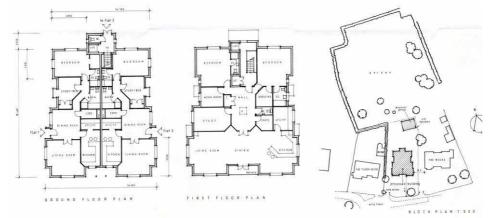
Floorplans and Block Plan of Approved Apartment Block
